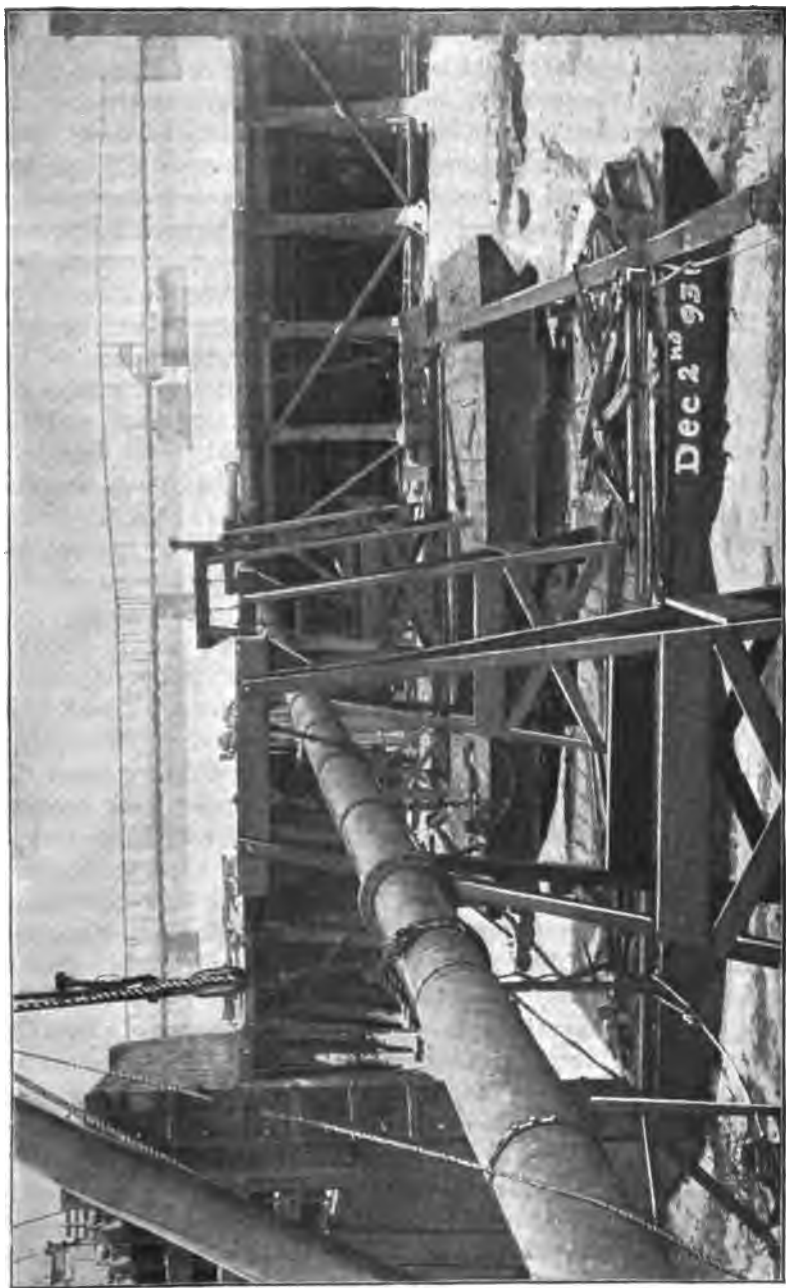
INSIDE VIEW OF BULKHEAD. LOCK PUMPED DRY.
